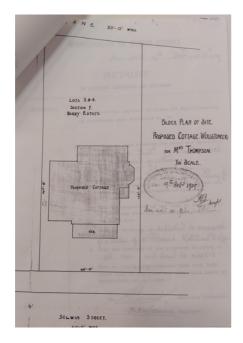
(Left) Block Plan, 7 Selwyn Street. Stanton Library.
